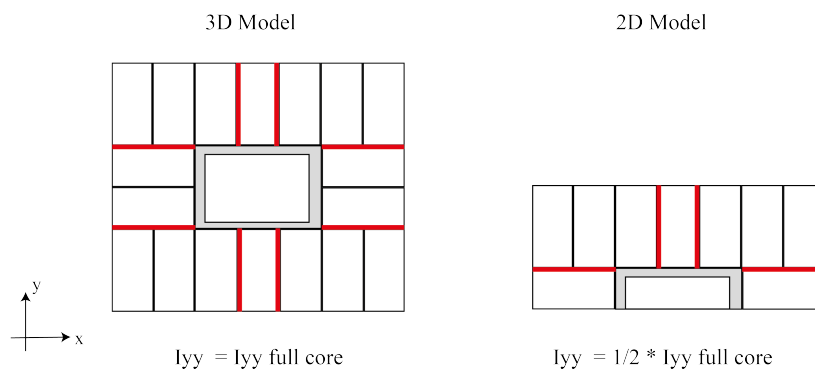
Core to module connections in the exploded floor plan (left) and in 2D cross-section (right)
